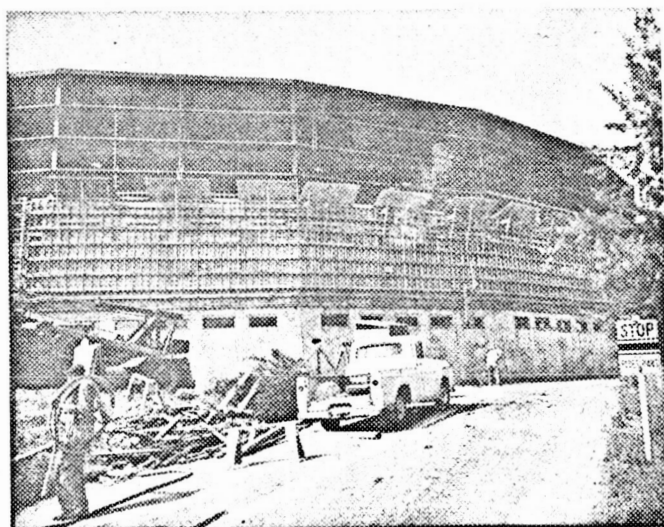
Exterior View of the New Addition to the Cyclotron Building. The portion of the wall which is concrete is to provide continuous shielding between the exterior and interior experimental areas.
